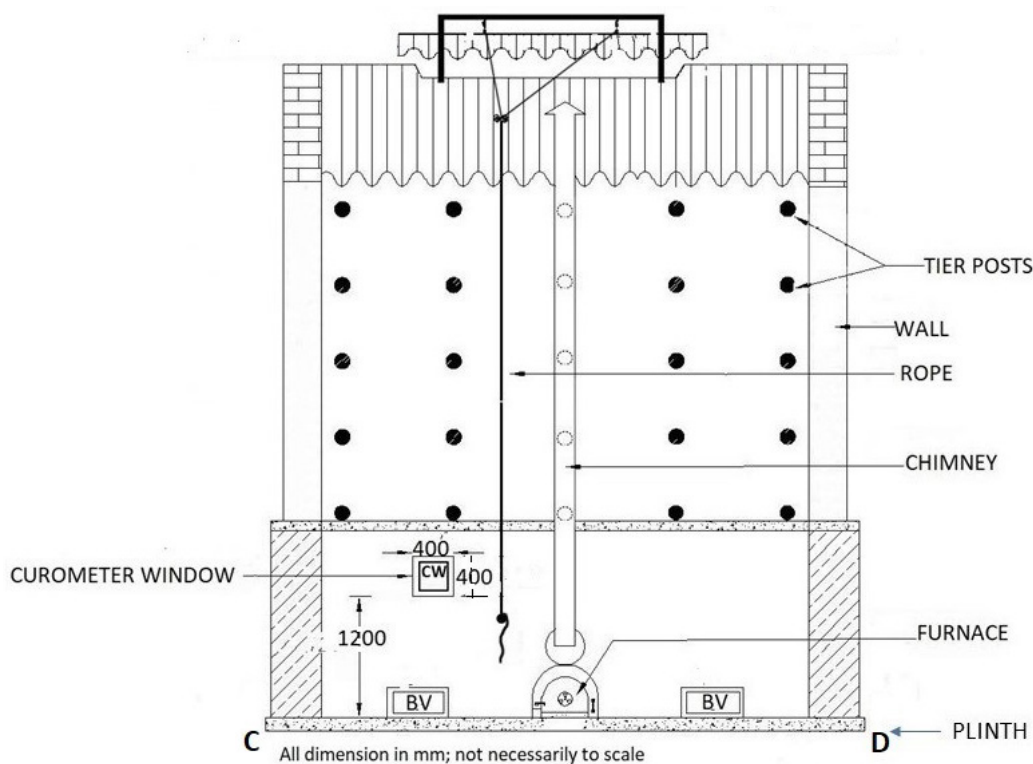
ELEVATION SIDE CD — BARN TYPE B
